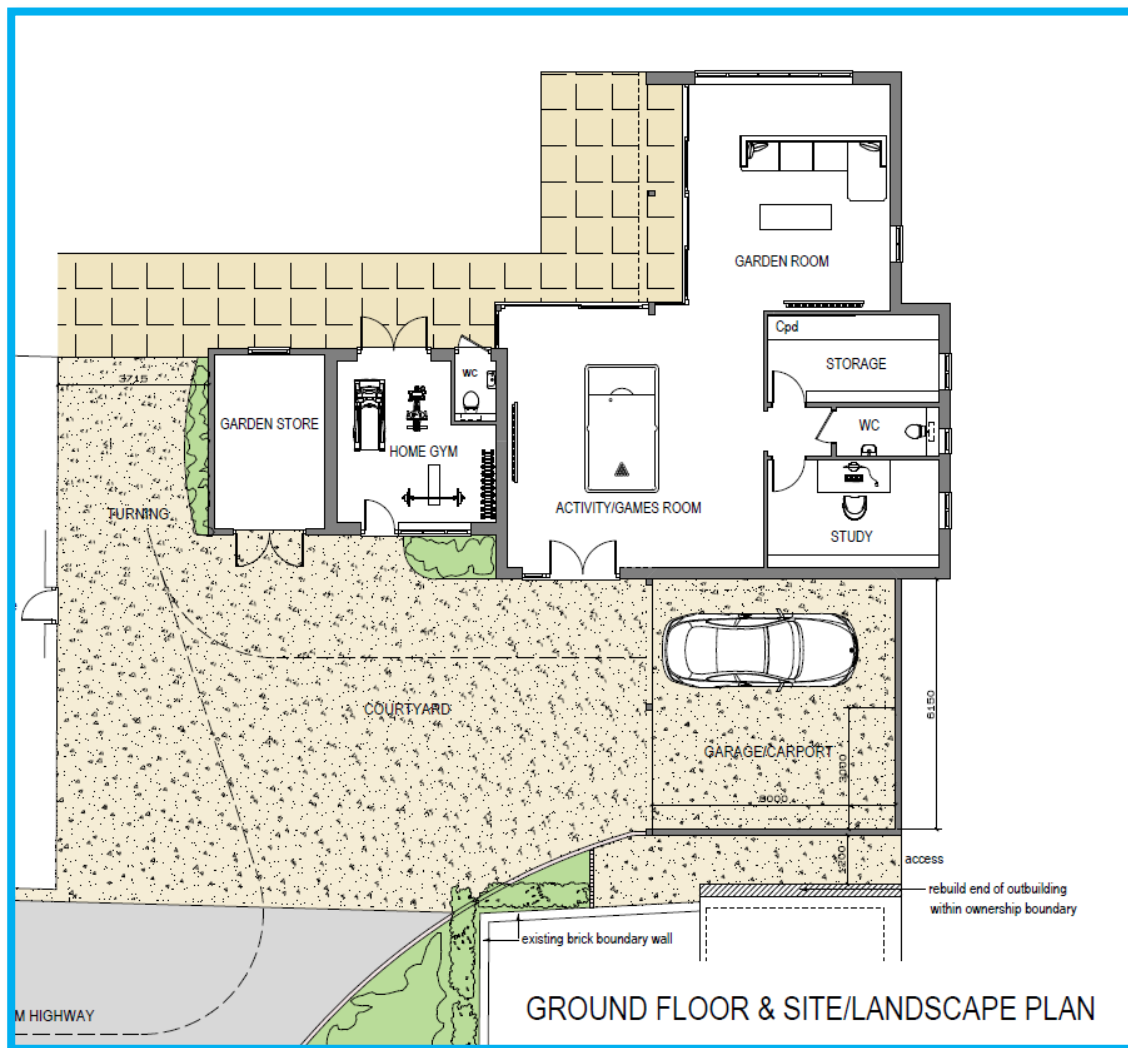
Proposed building and landscaping – note existing house and entrance to the left (York Associates)
